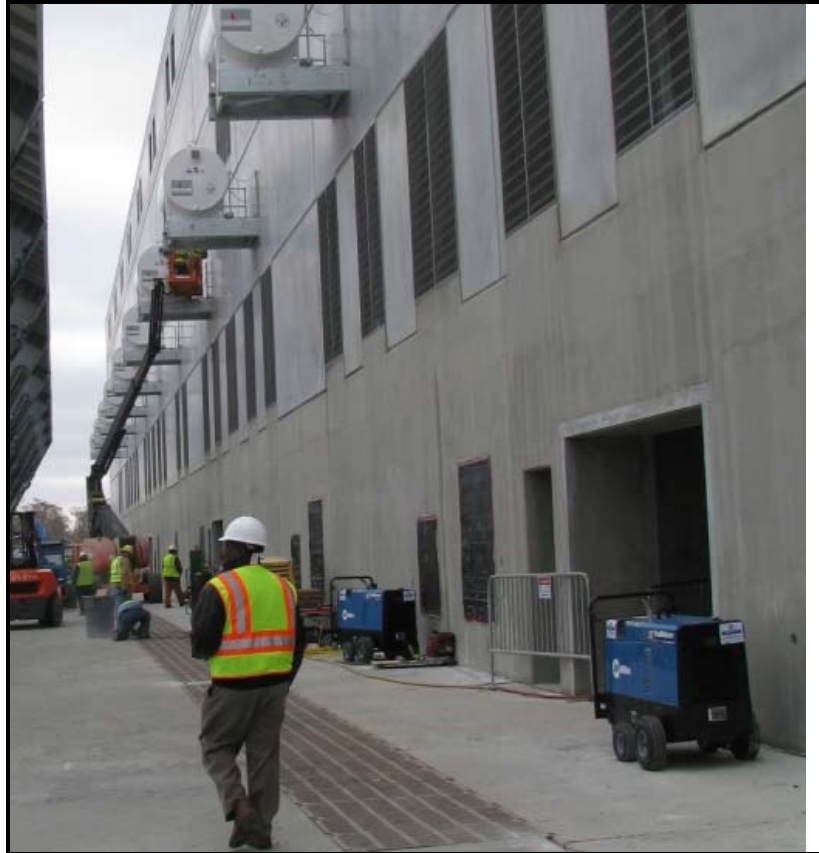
Pump station precast concrete wall panels do not sit on a uniform top of cast-in-place elevation
